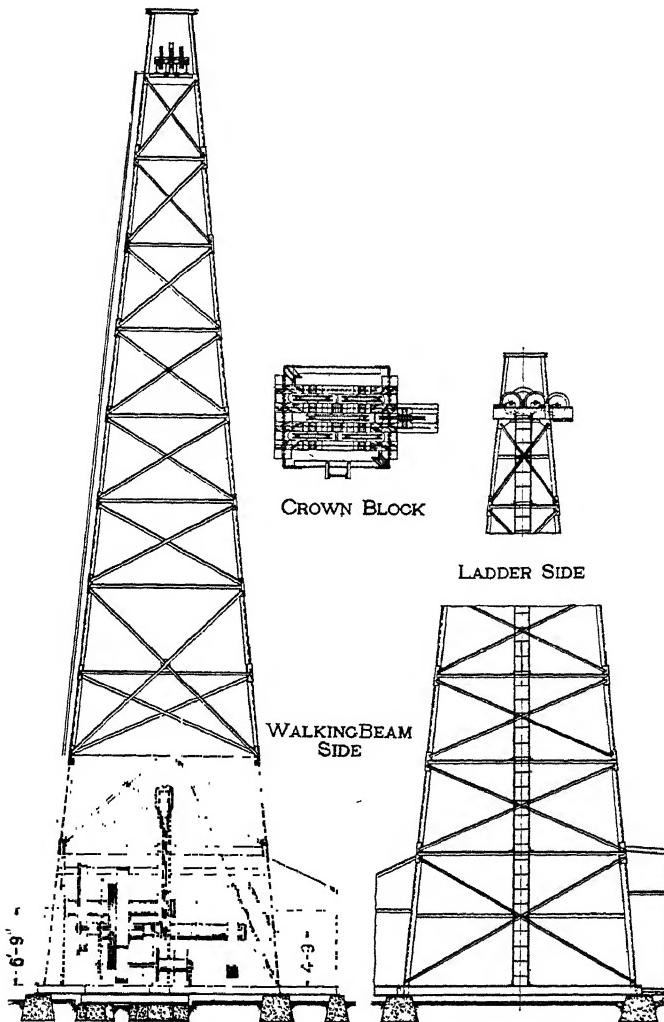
A.—80-FT. WOODWORTH CALIFORNIA DRILLING RIG. THE COMPLETE MODERN STRUCTURE.
